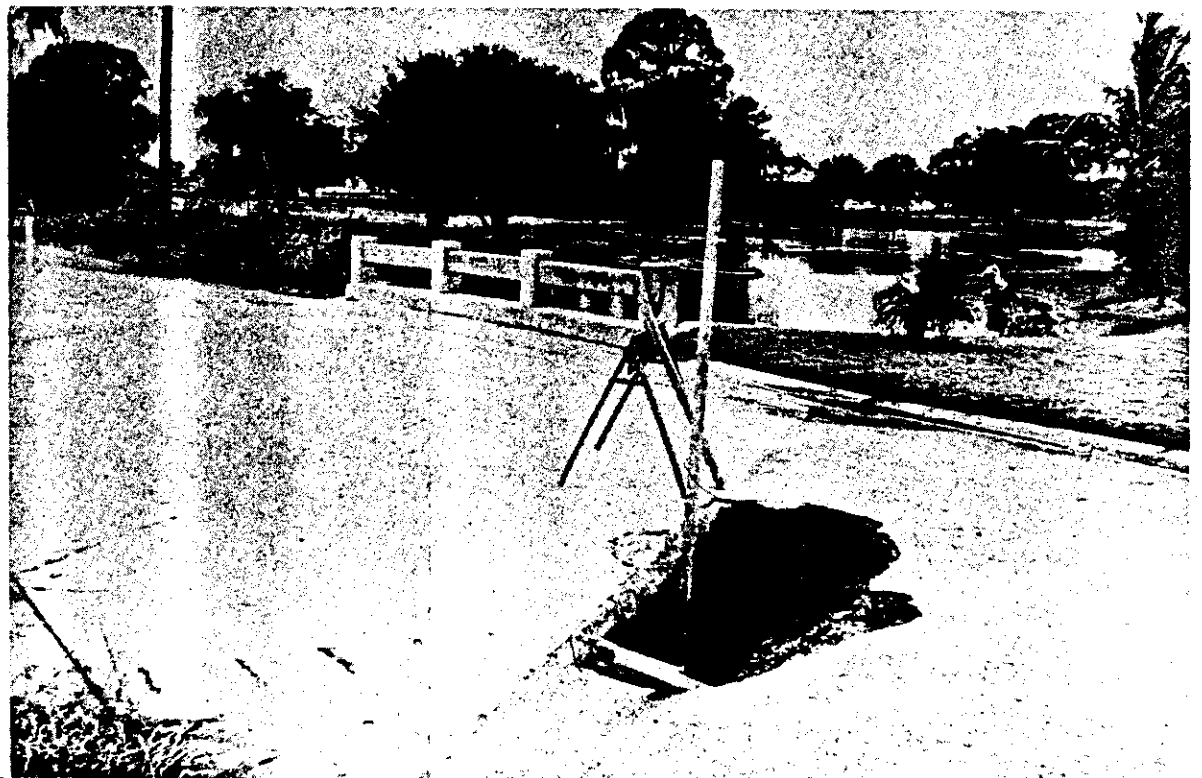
DRAINAGE DITCH AT FRUITVILLE ROAD NEAR
